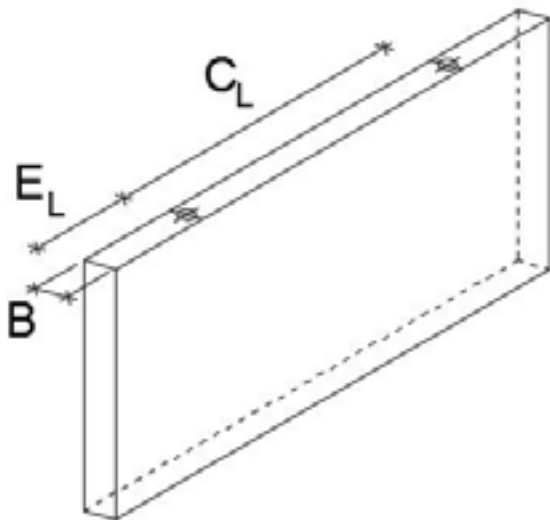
Minimum element thickness and lifting insert spacing in wall elements
